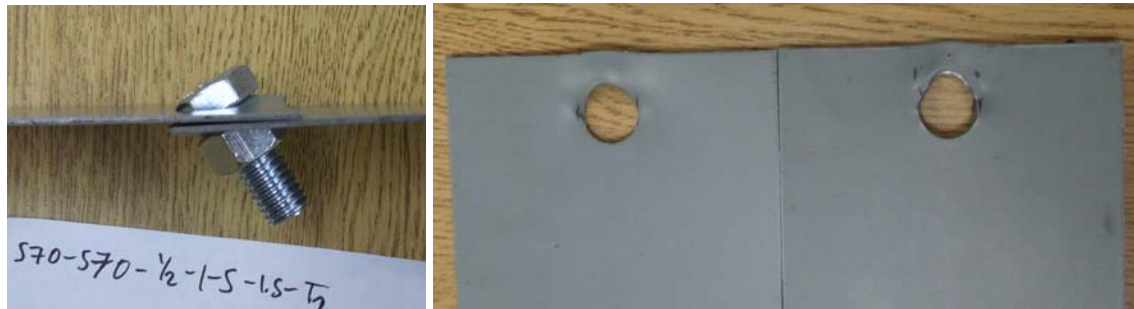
Shear Failure of Test Specimen 570-570-1/2-1-S-1.5-T2
